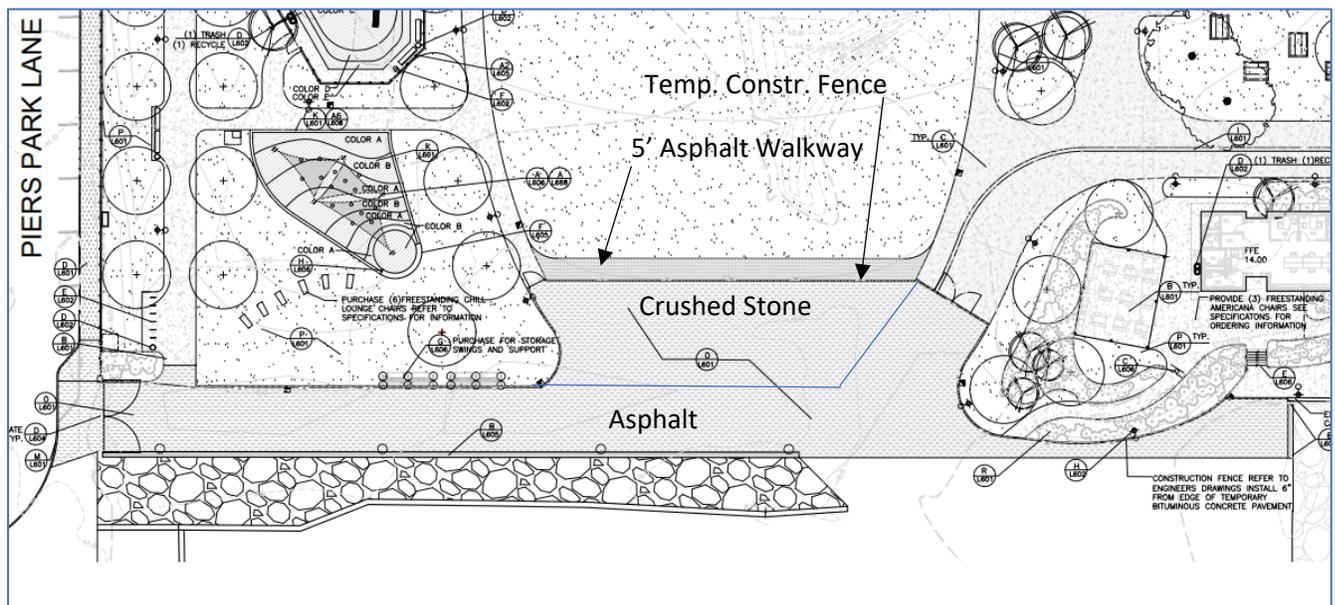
Temporary Asphalt and Crushed Stone Pavements During Pier Park III Construction
